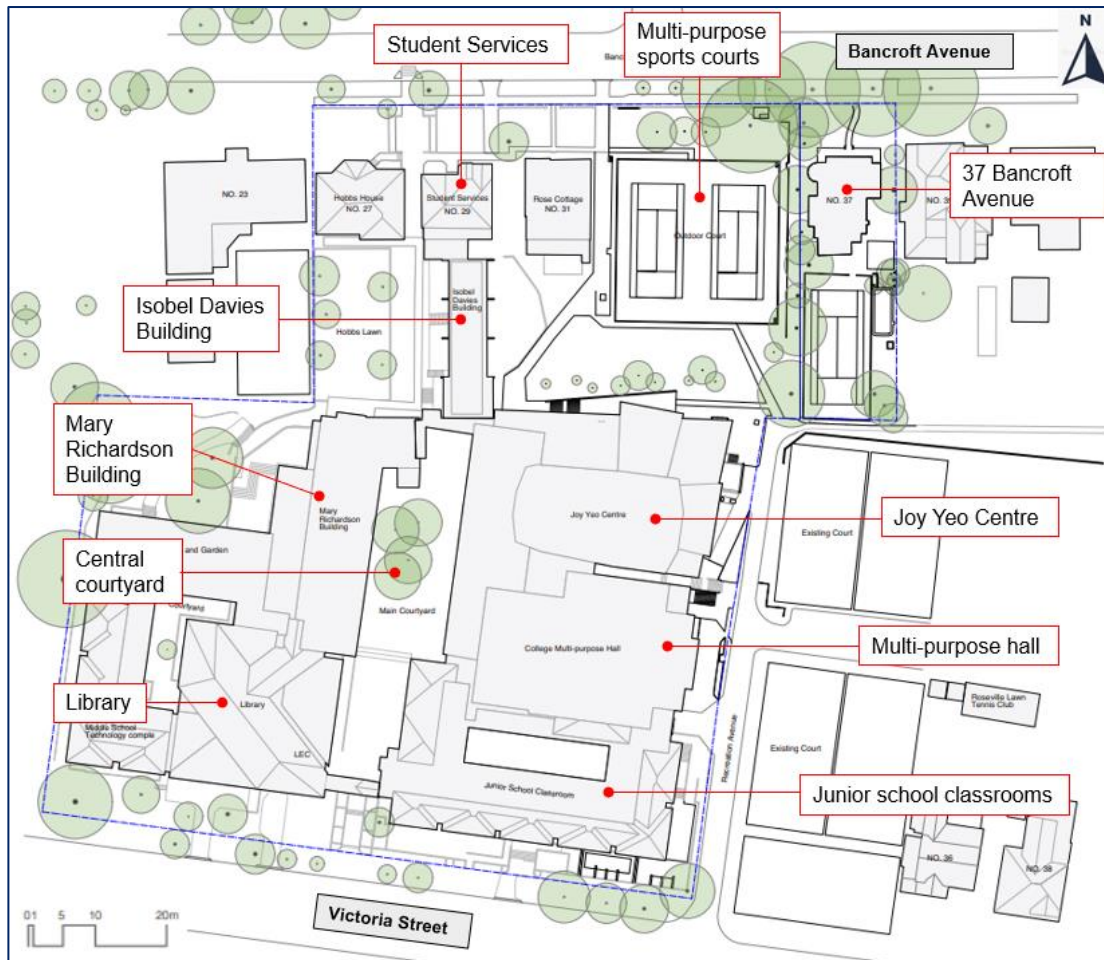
| Existing Roseville College campus layout (Source: Department's Assessment report SSD-9912)
